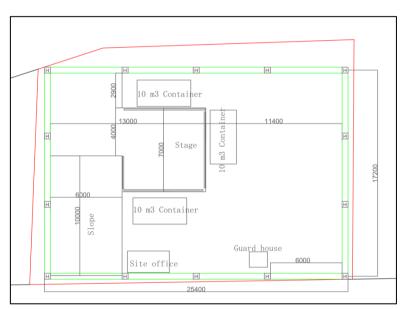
Tentative Layout Plan for Transfer Station
